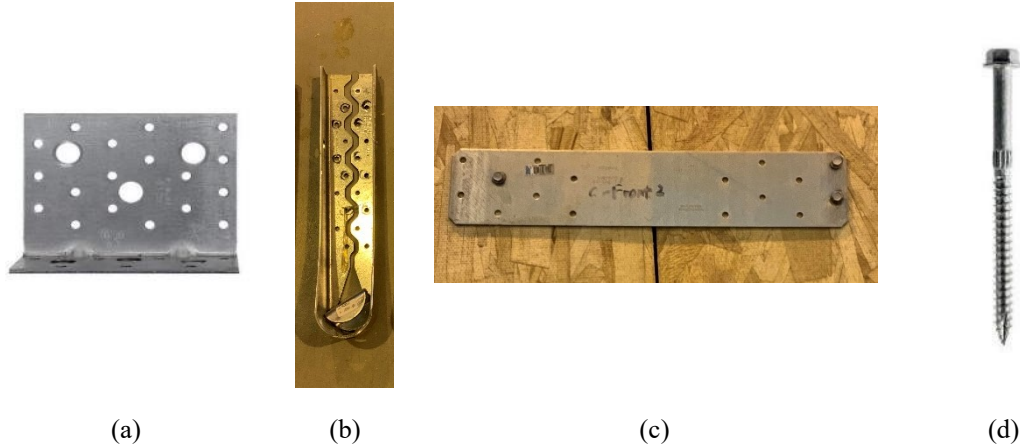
Connection hardware used in the fabrication of shear wall specimens: (a) angle bracket; (b) hold-down; (c) steel plate; and (d) SDS screw (courtesy of Simpson Strong-Tie®)
